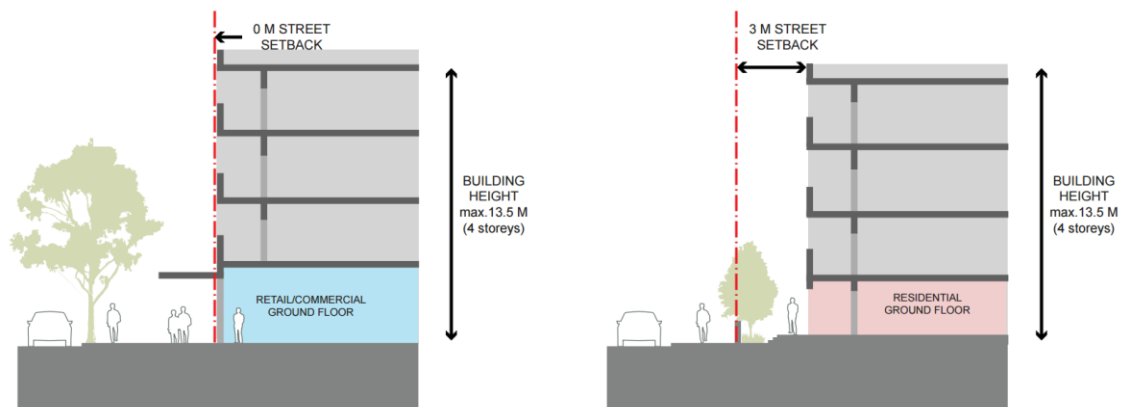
Front setbacks for retail/commercial ground floor and residential ground floor
